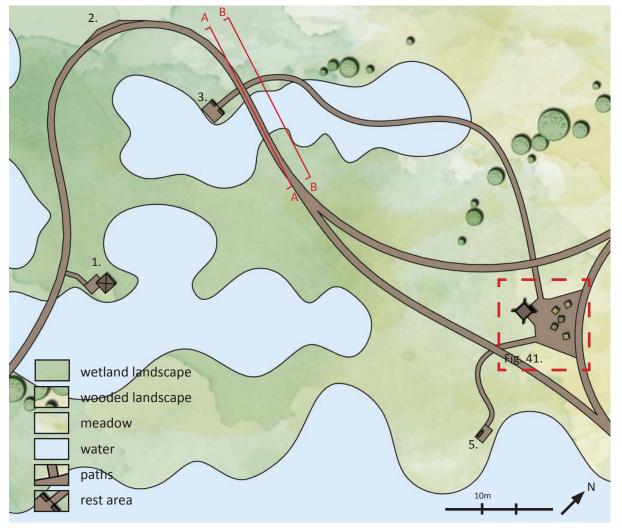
Plan of educational platform and observation tower. Fig. 41: A view of observation tower.
